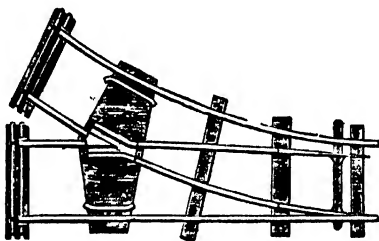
Light Steel Railway (Left-hand Points or Crossing)
